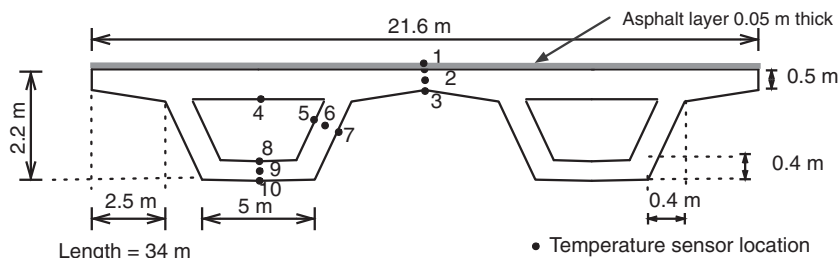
Cross-sectional dimension of 34 m long bridge girder.
